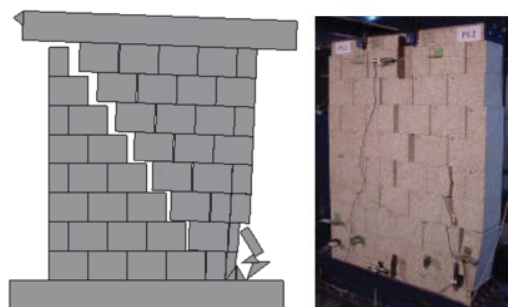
Failure pattern of dry masonry wall (numerical and experimental)
